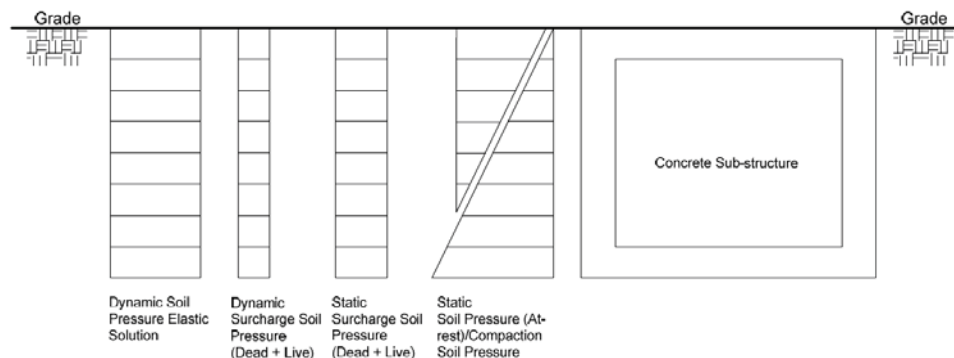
Combination of Soil Pressure Loads on the SHINE Facility Sub-grade Walls
